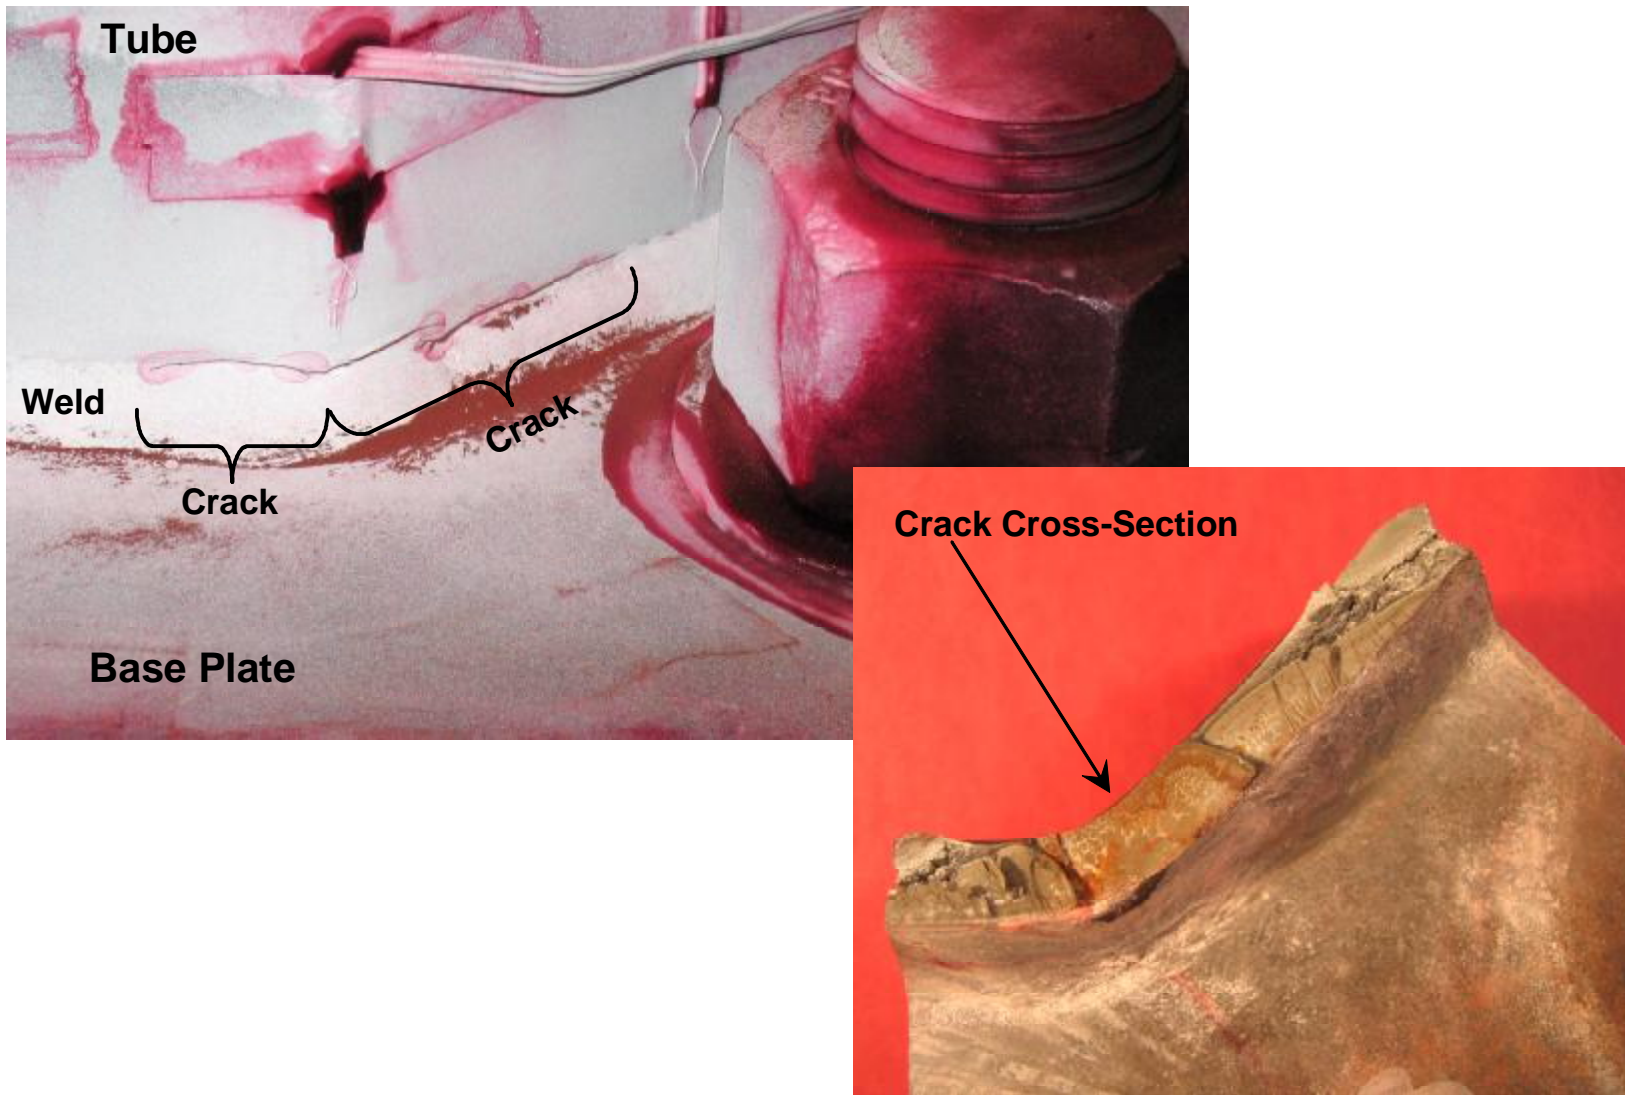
Weld toe cracks in pole socket connections.
